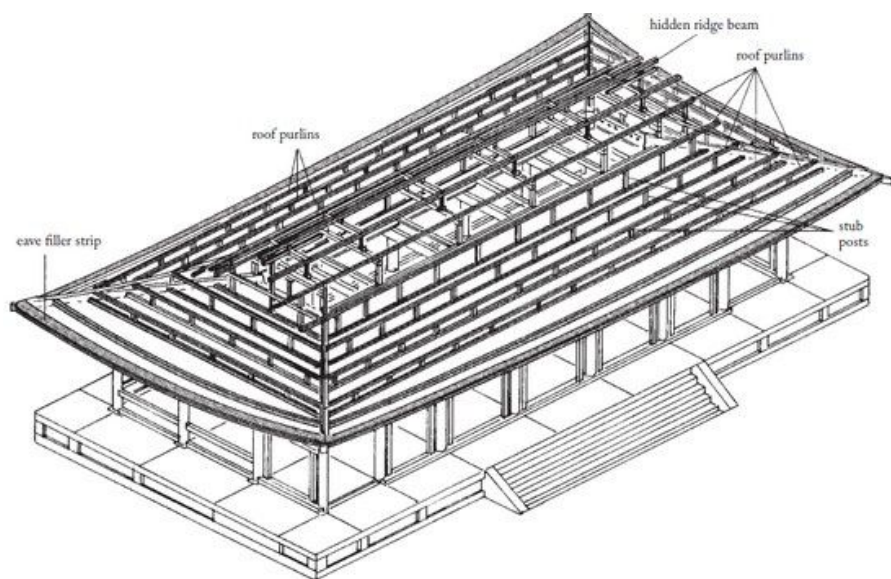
The Picture Hall after installation of hidden roof structure (rafters and bridging omitted for clarity).
